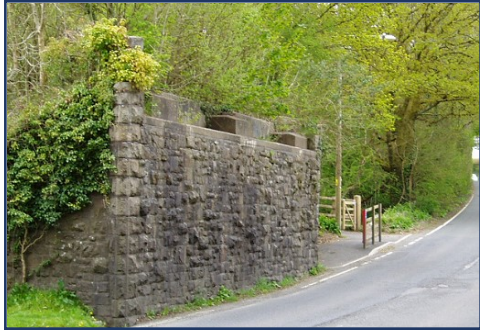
The Abbotsfield bridge south side abutment showing insert area at the top for the former iron deck. The abutments could be built up to provide adequate clearance below. A bow string bridge is suggested.
